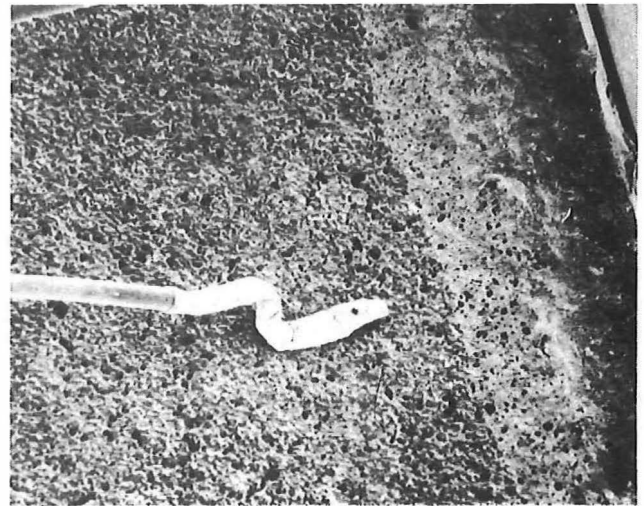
'Woolly sock' appearance of defective header bond shown in Fig. 12
